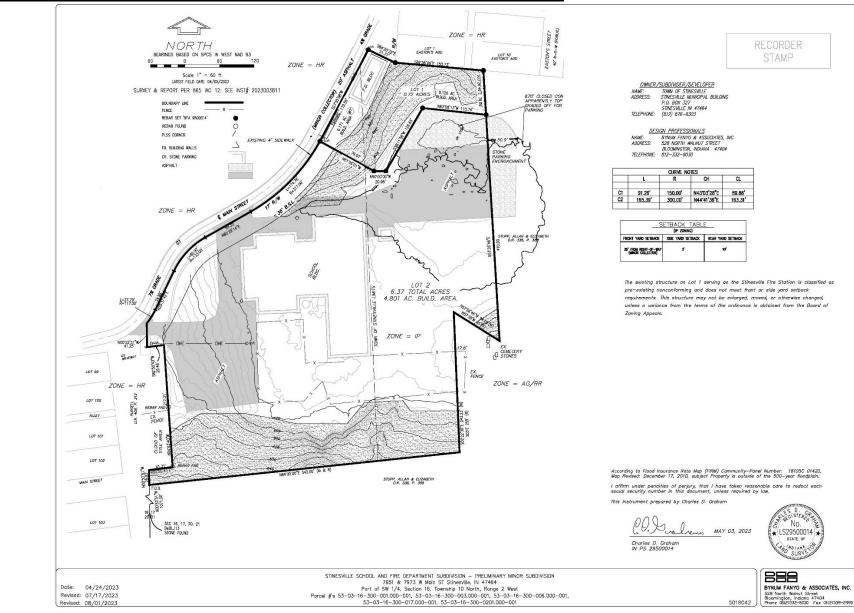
Stinesville School and Fire Department Minor Subdivision – Preliminary Plat
